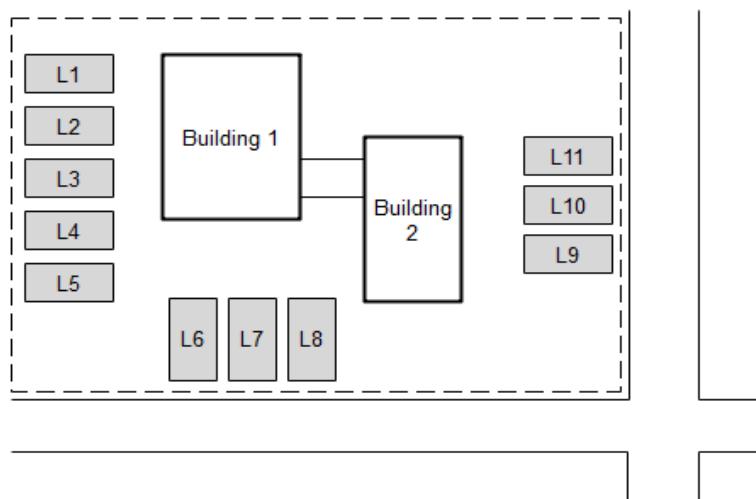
Site plan with 11 predetermined locations for service facilities.
